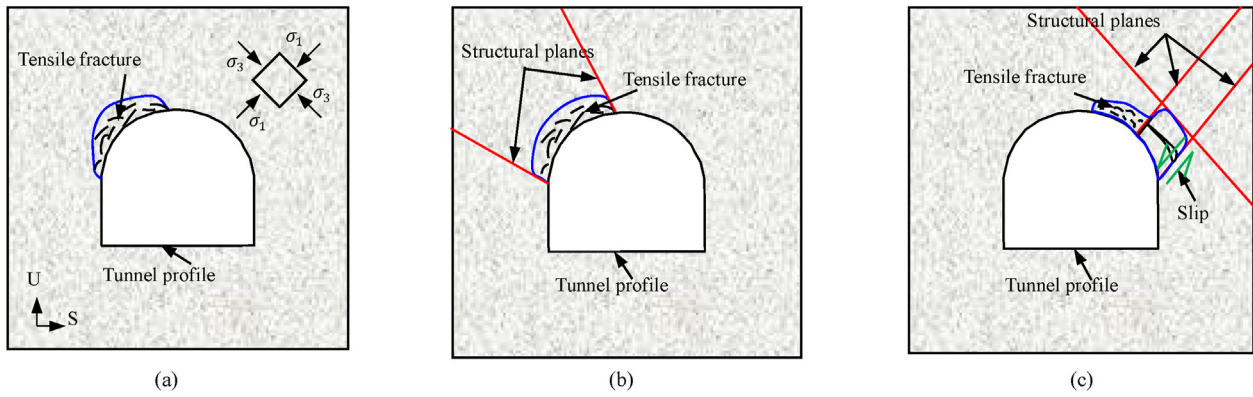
Schematic diagram of the rockbursts occurred (a) at the north spandrel of the tunnel wherein no clear structural plane was revealed, (b) at the north spandrel of the tunnel wherein two stiff structural planes were revealed, and (c) at the south sidewall to the south spandrel of the tunnel wherein three stiff structural planes were revealed.
